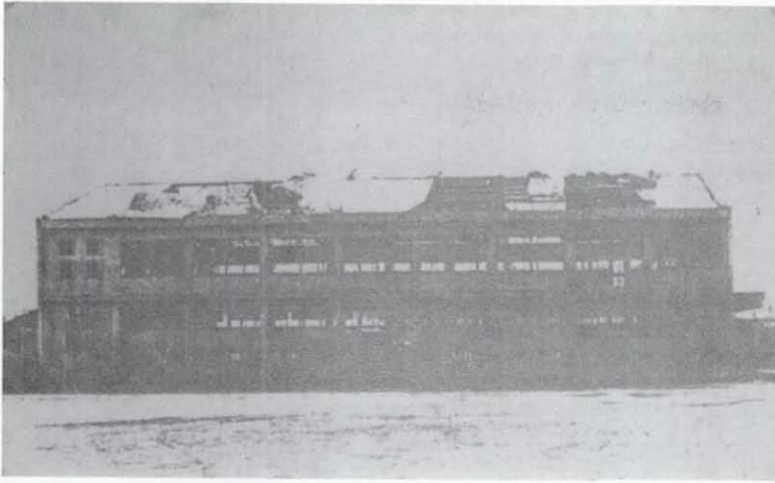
DAMAGE TO SHEET METAL ROOFING OF A GYMNASIUM
